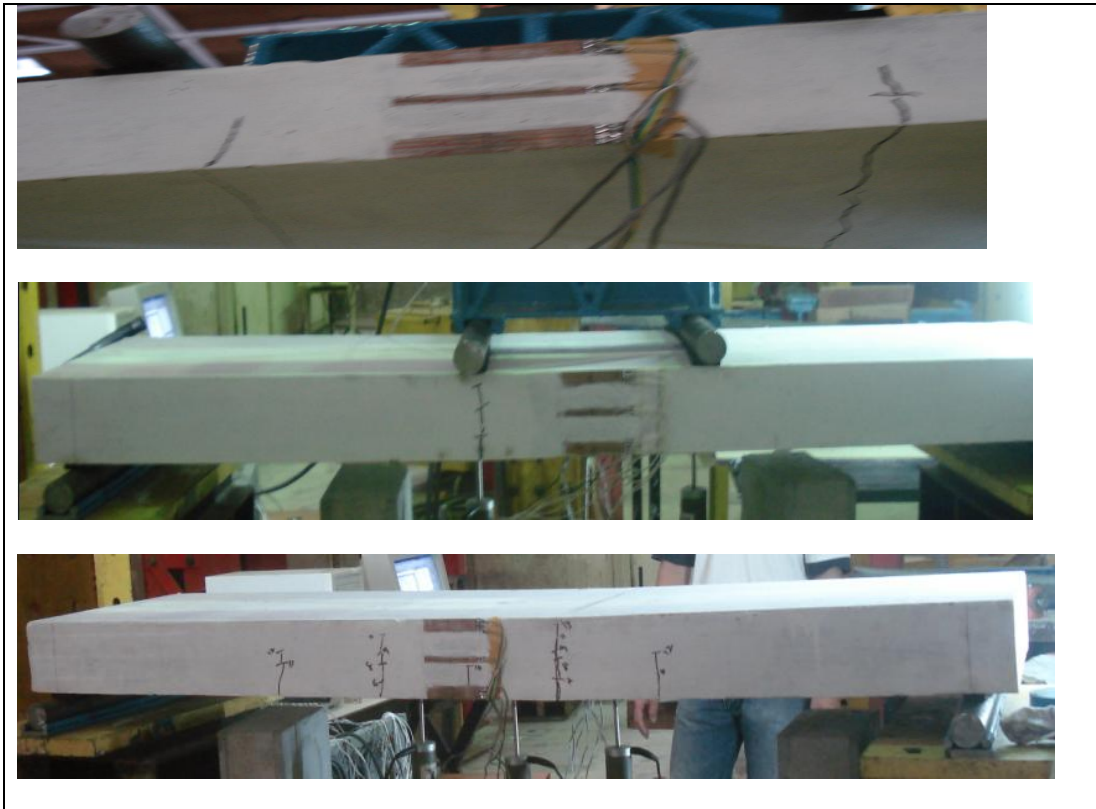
Failure mode of sandwich wall element with reinforcement (wire mesh and others) in flexure
